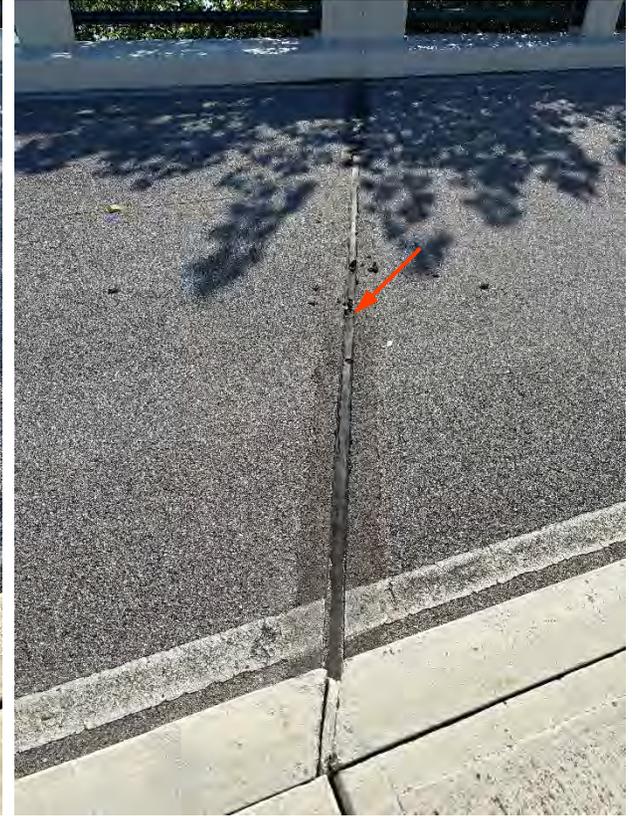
EXP. JT. 7, ADHESION FAILURE, RUTTING
